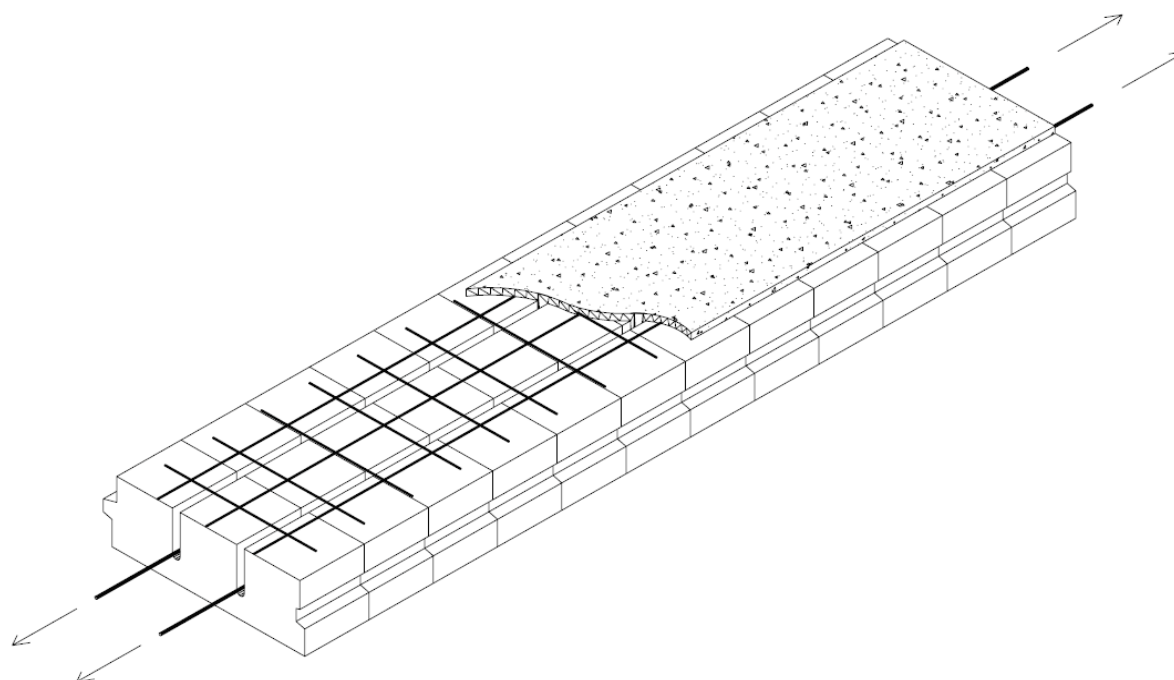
The complete floor panel, including prestressing strands and tensile reinforcement.
